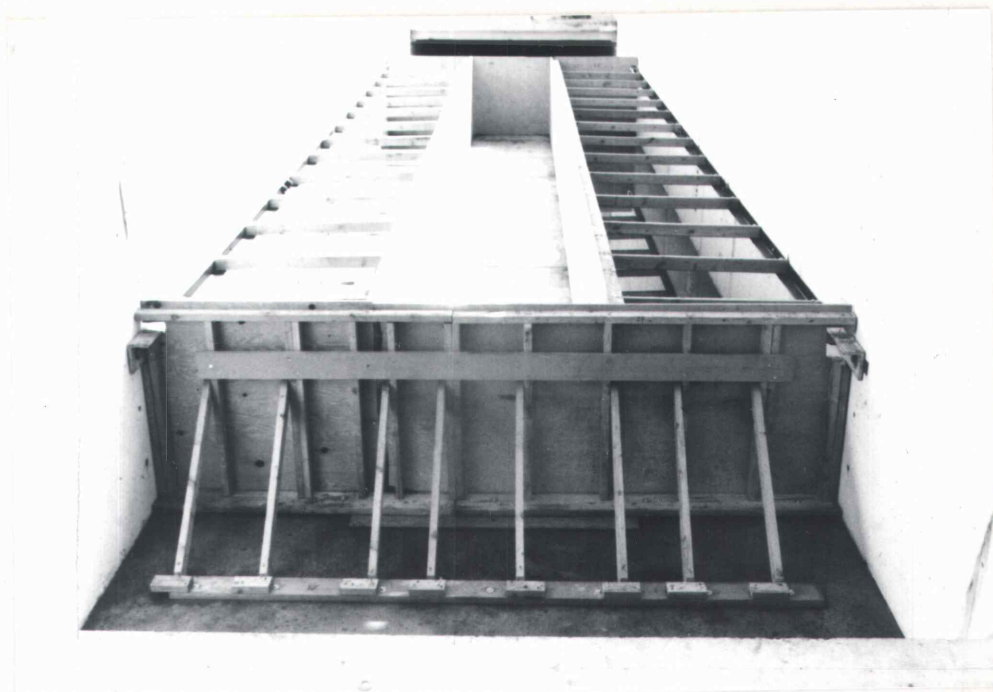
In place photograph of the test section before the addition of the soil layers.
